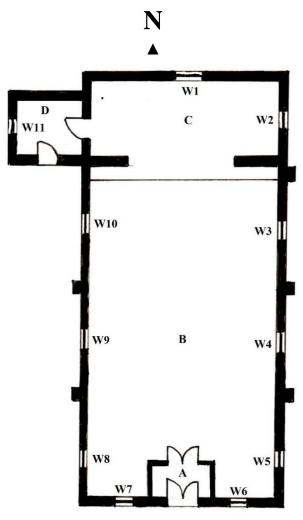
Floor plan of St. Lawrence O'Toole Catholic church, Wollar – not to scale (John Broadley)
